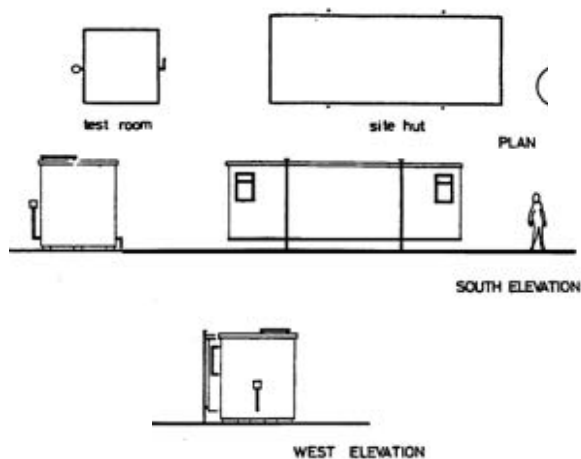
EMC Gas Test Facility Site Plan and Elevations
